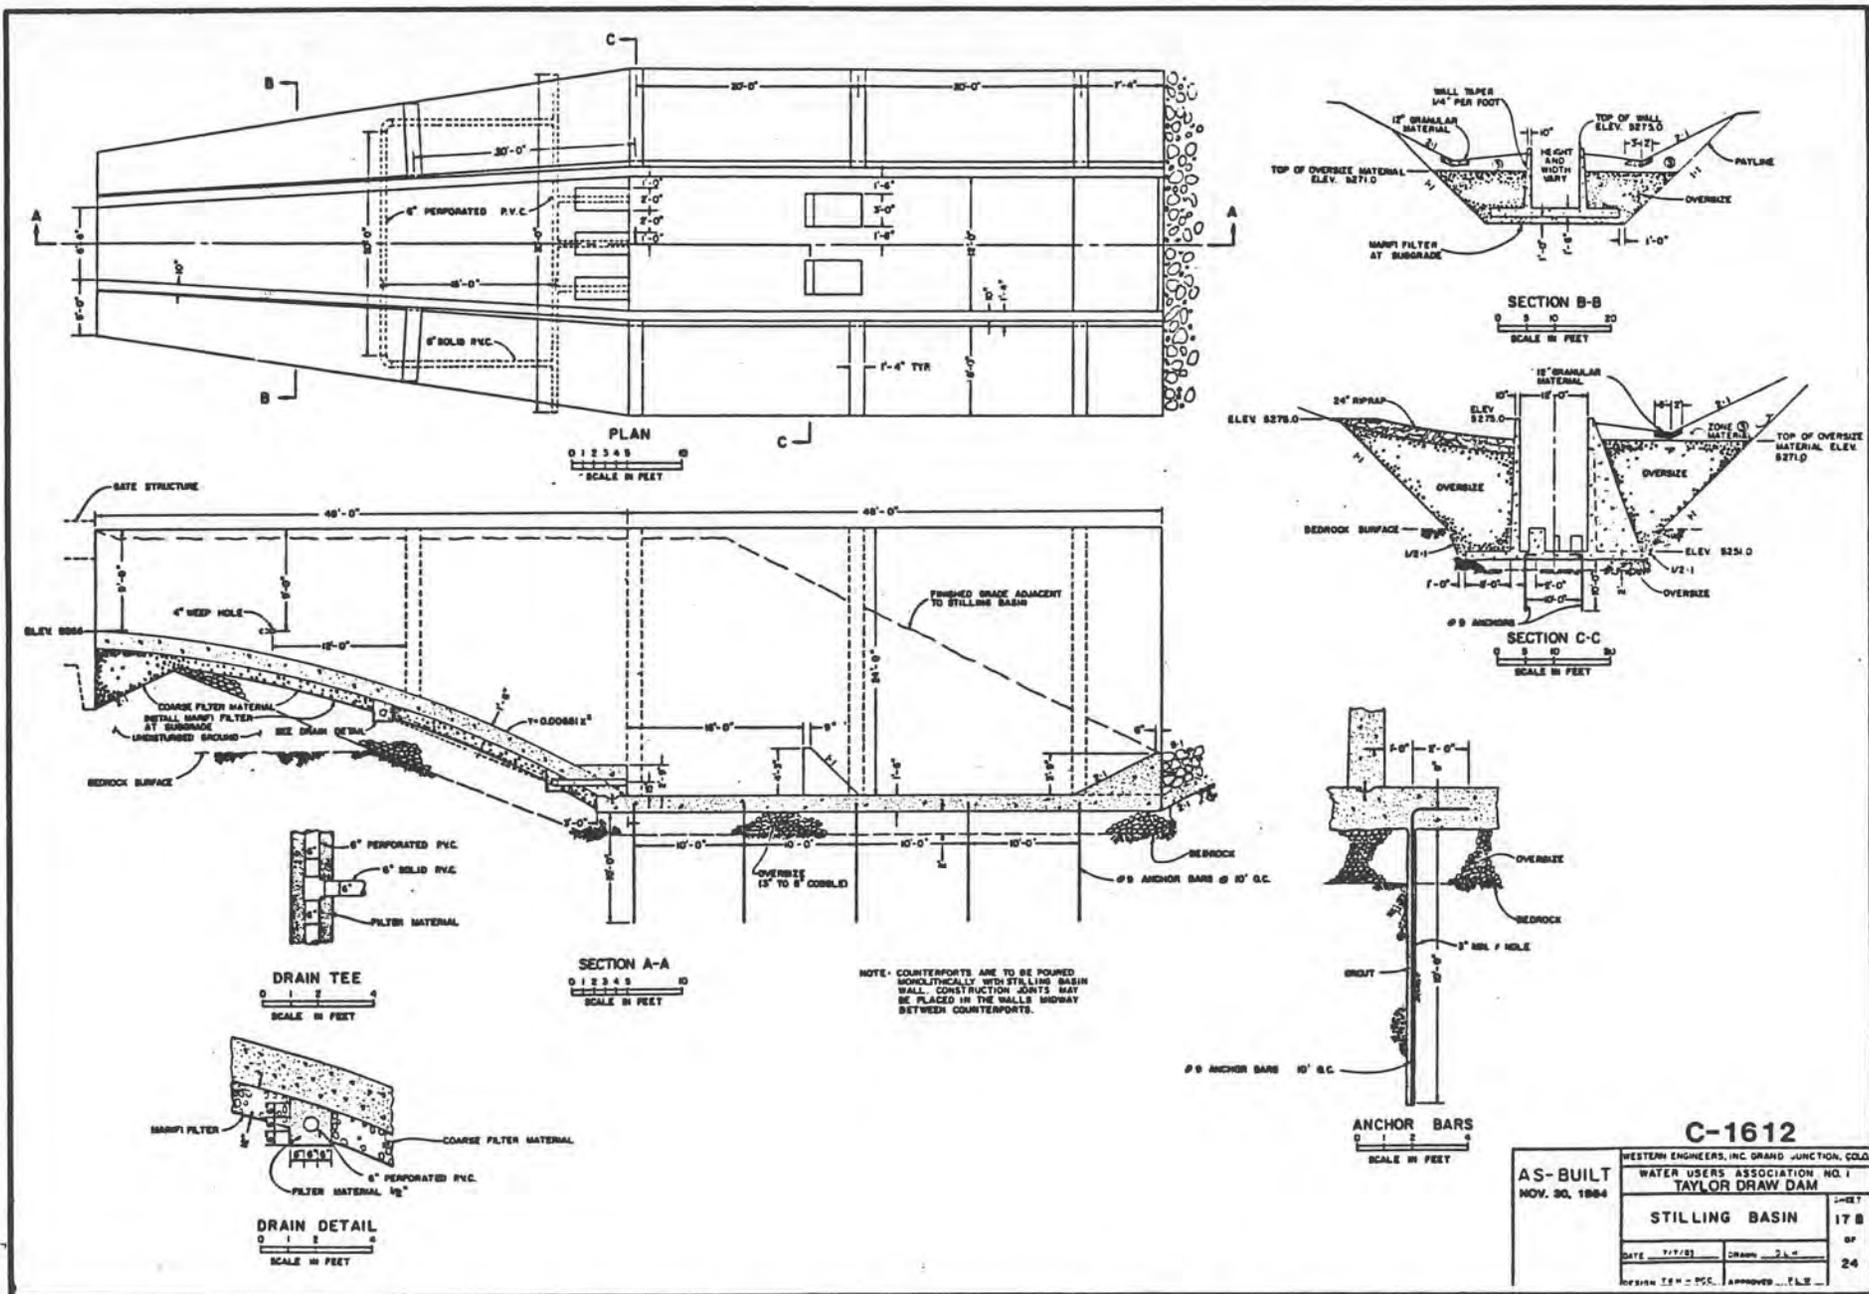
AS-BUILT STILLING BASIN PLAN & PROFILE
